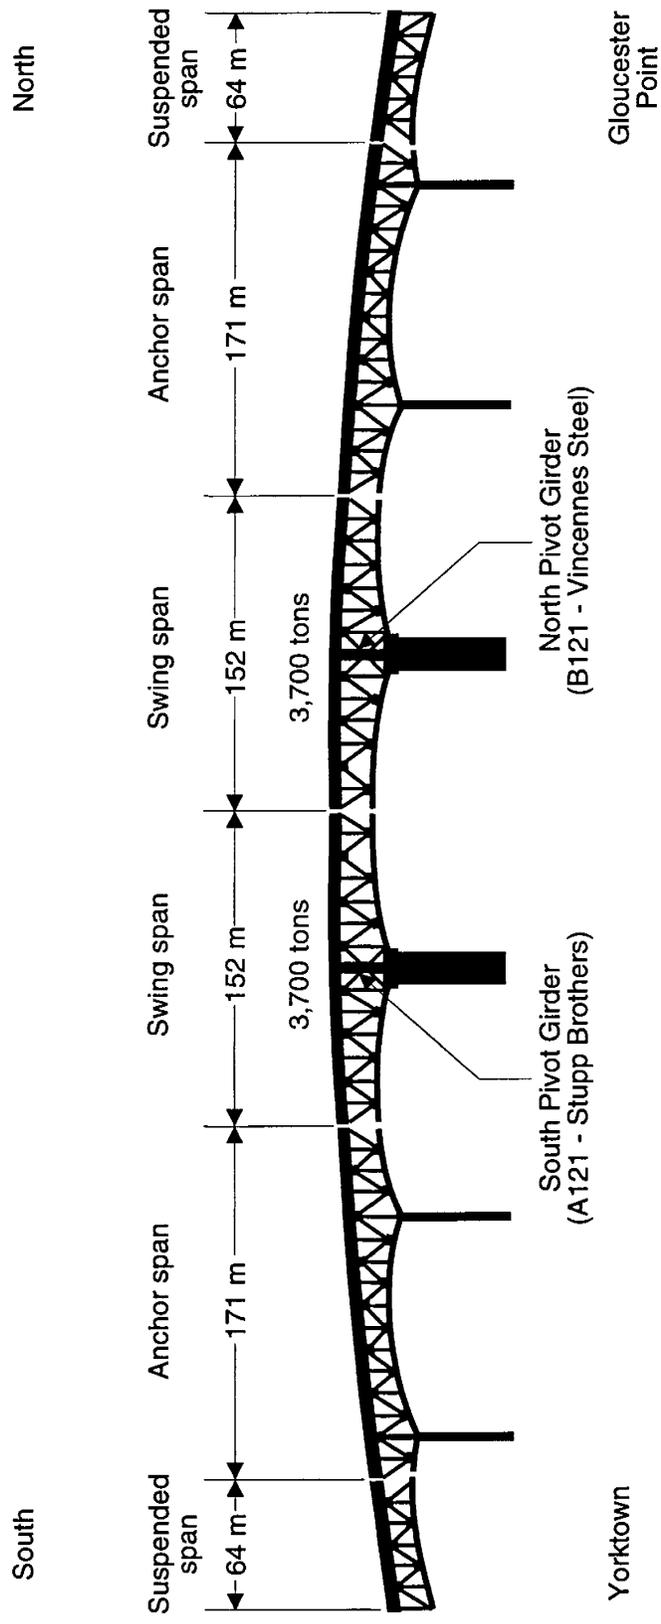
Elevation Looking West for the George P. Coleman Bridge.
